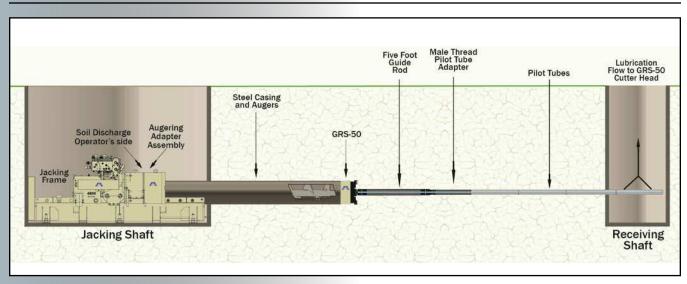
The Guide Rod Swivel 50 is a bearing swivel, cutter head and guide rod combined.
